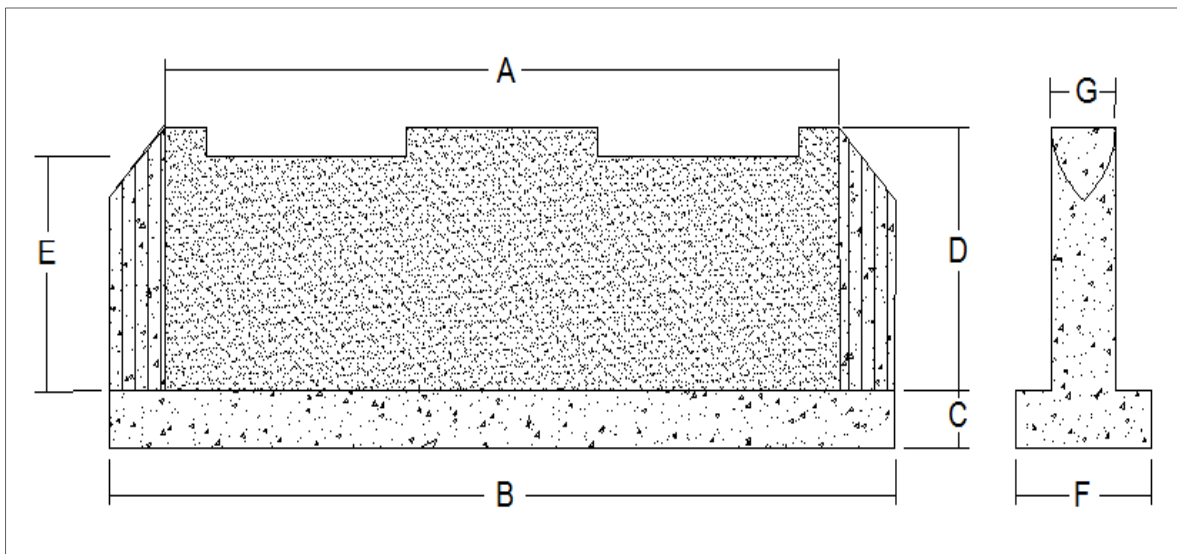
9. Piers elevation view (see dimensions in Table 1.1).
